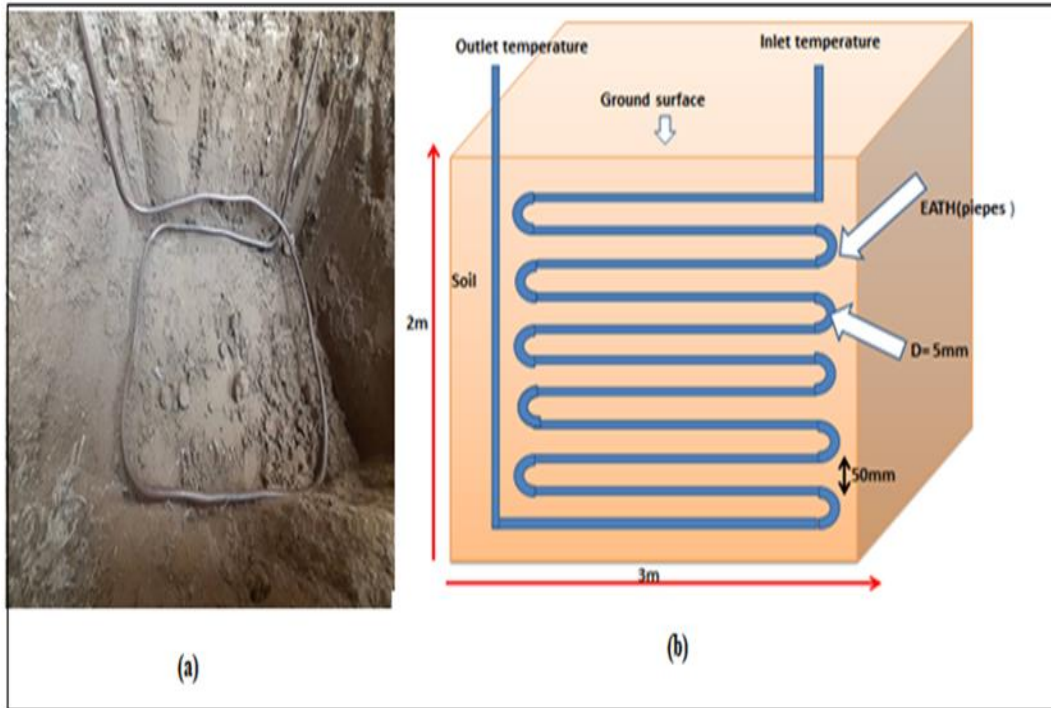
(a) A photo of the coiled pipes before being buried and (b) aesthetic view
